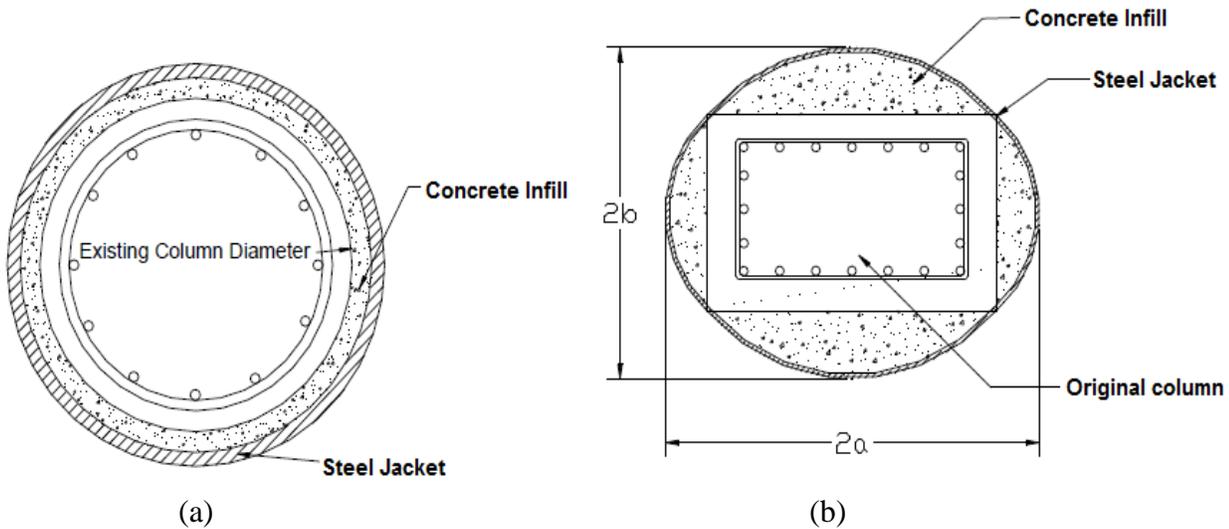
Column retrofitting using steel jacket (a) circular column, (b) rectangular column
